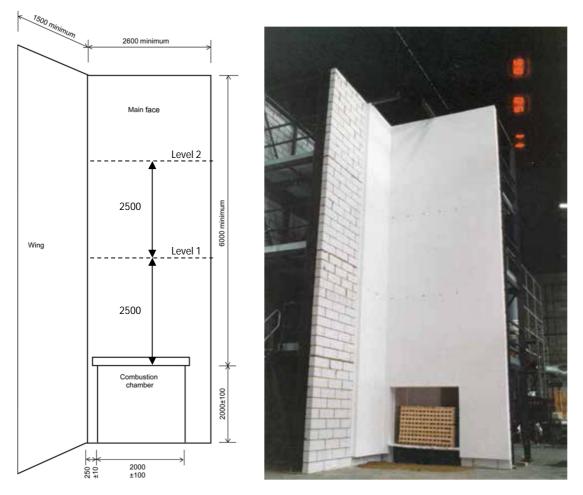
BS8414-1 test rig (from BRE report BR135^[116])
